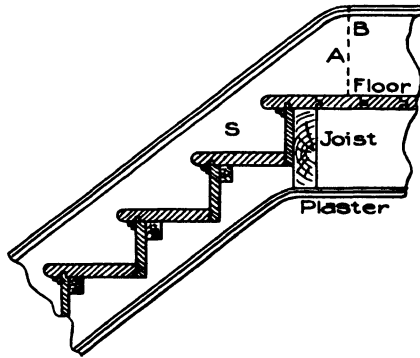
Showing How Wall String Is Finished at Top of Stairs.
